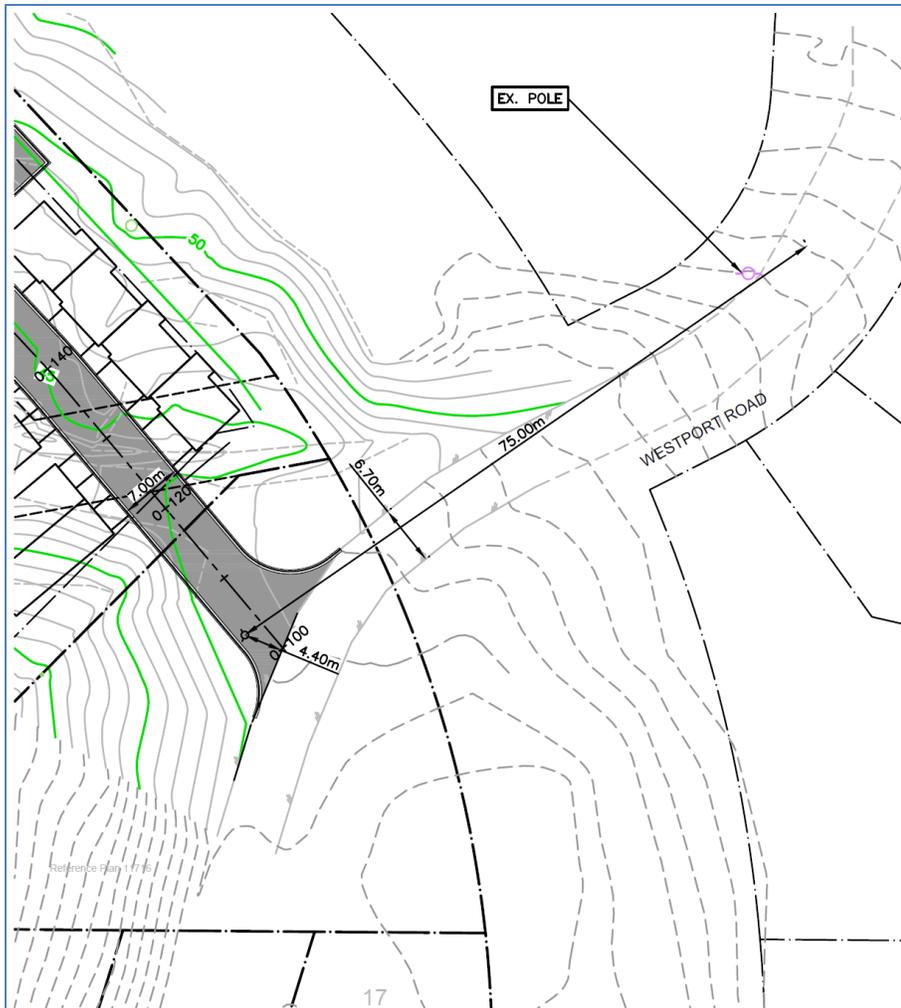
Westport Road Driveway - Intersection Sight Lines current design
